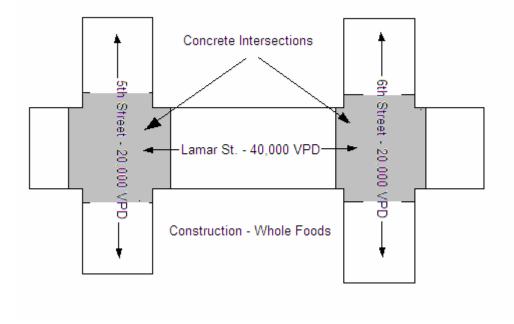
Traffic counts for Lamar Boulevard between 5th Street and 6th Street
